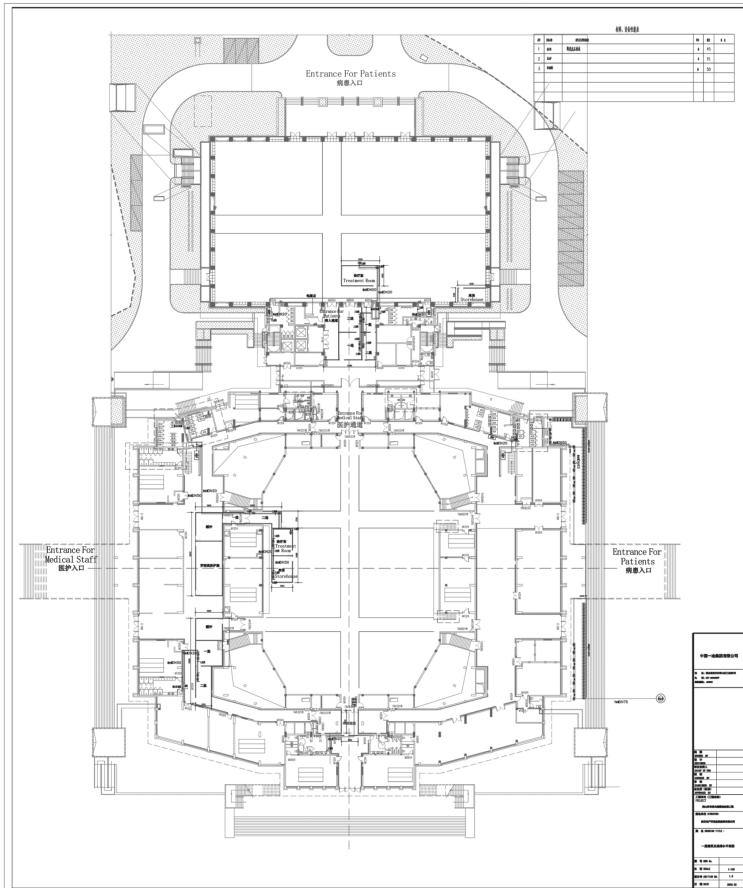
Building, water supply and drainage plan of Wuchang Fangcang Shelter Hospital Floor 1
